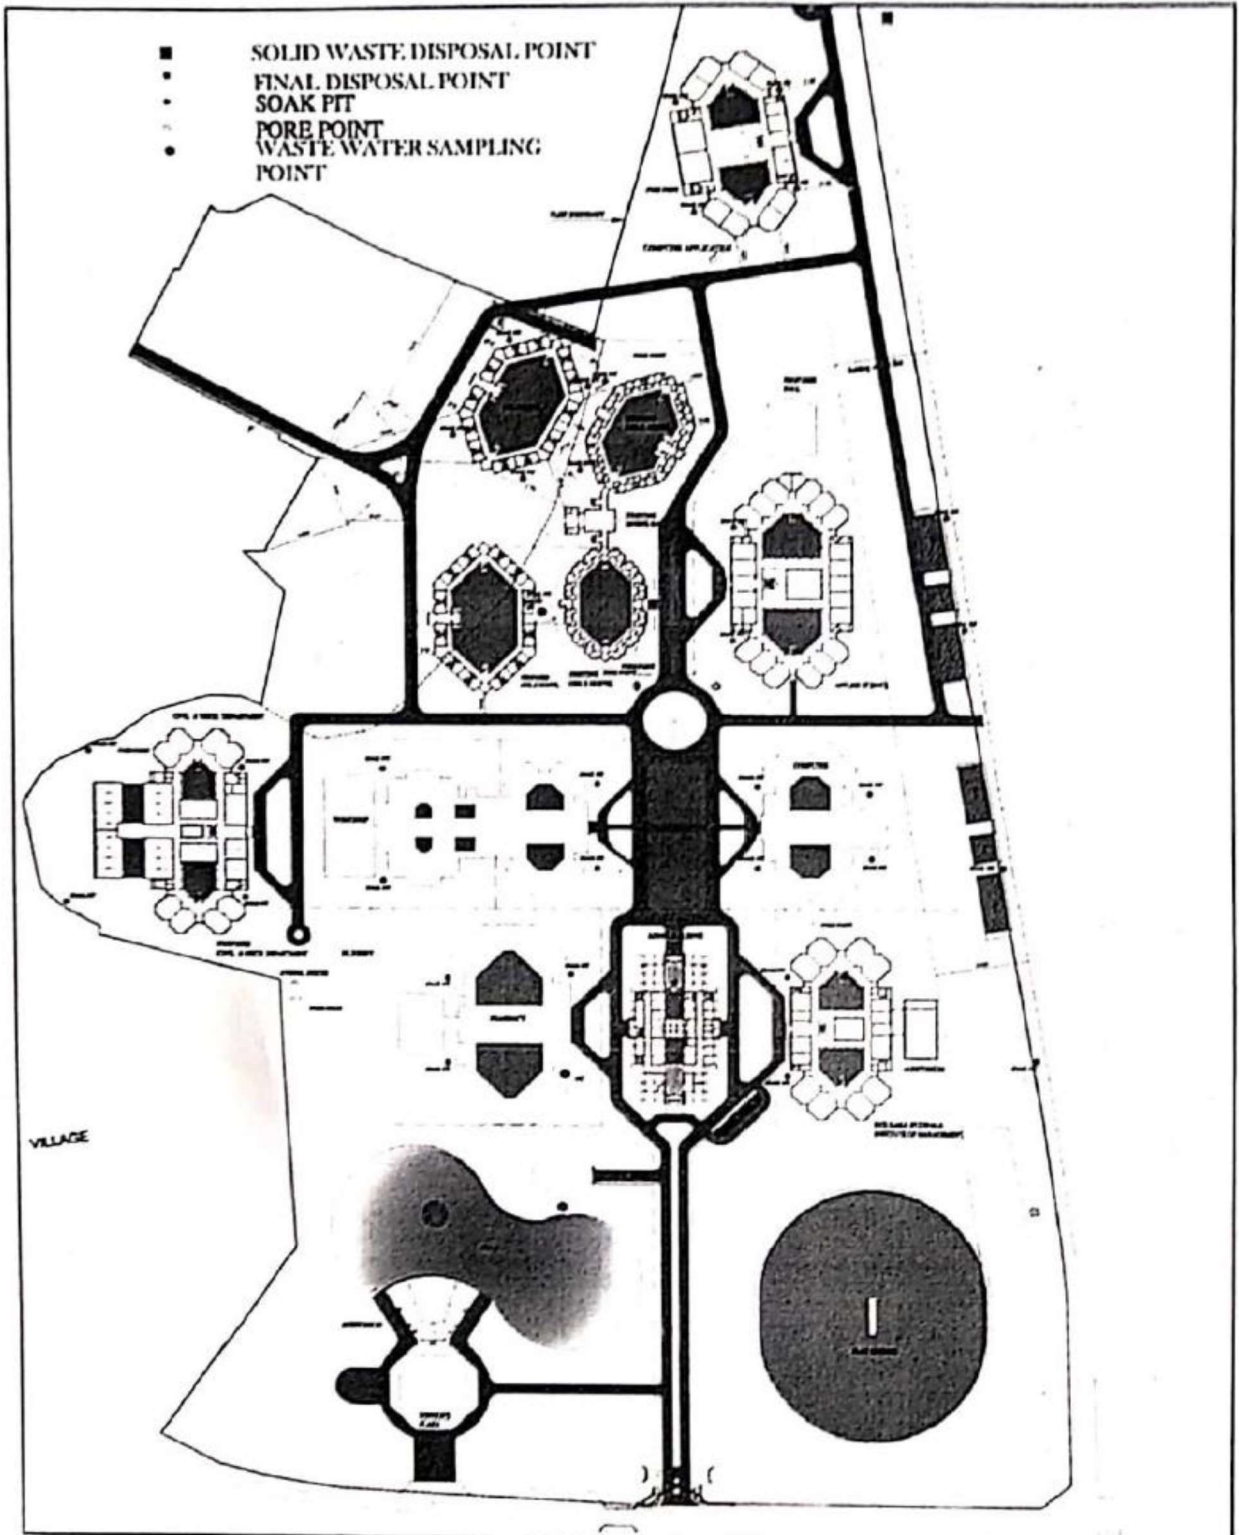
Site Plan of CHARUSAT mentioning location of Soak Pits/ Sampling points, etc.
